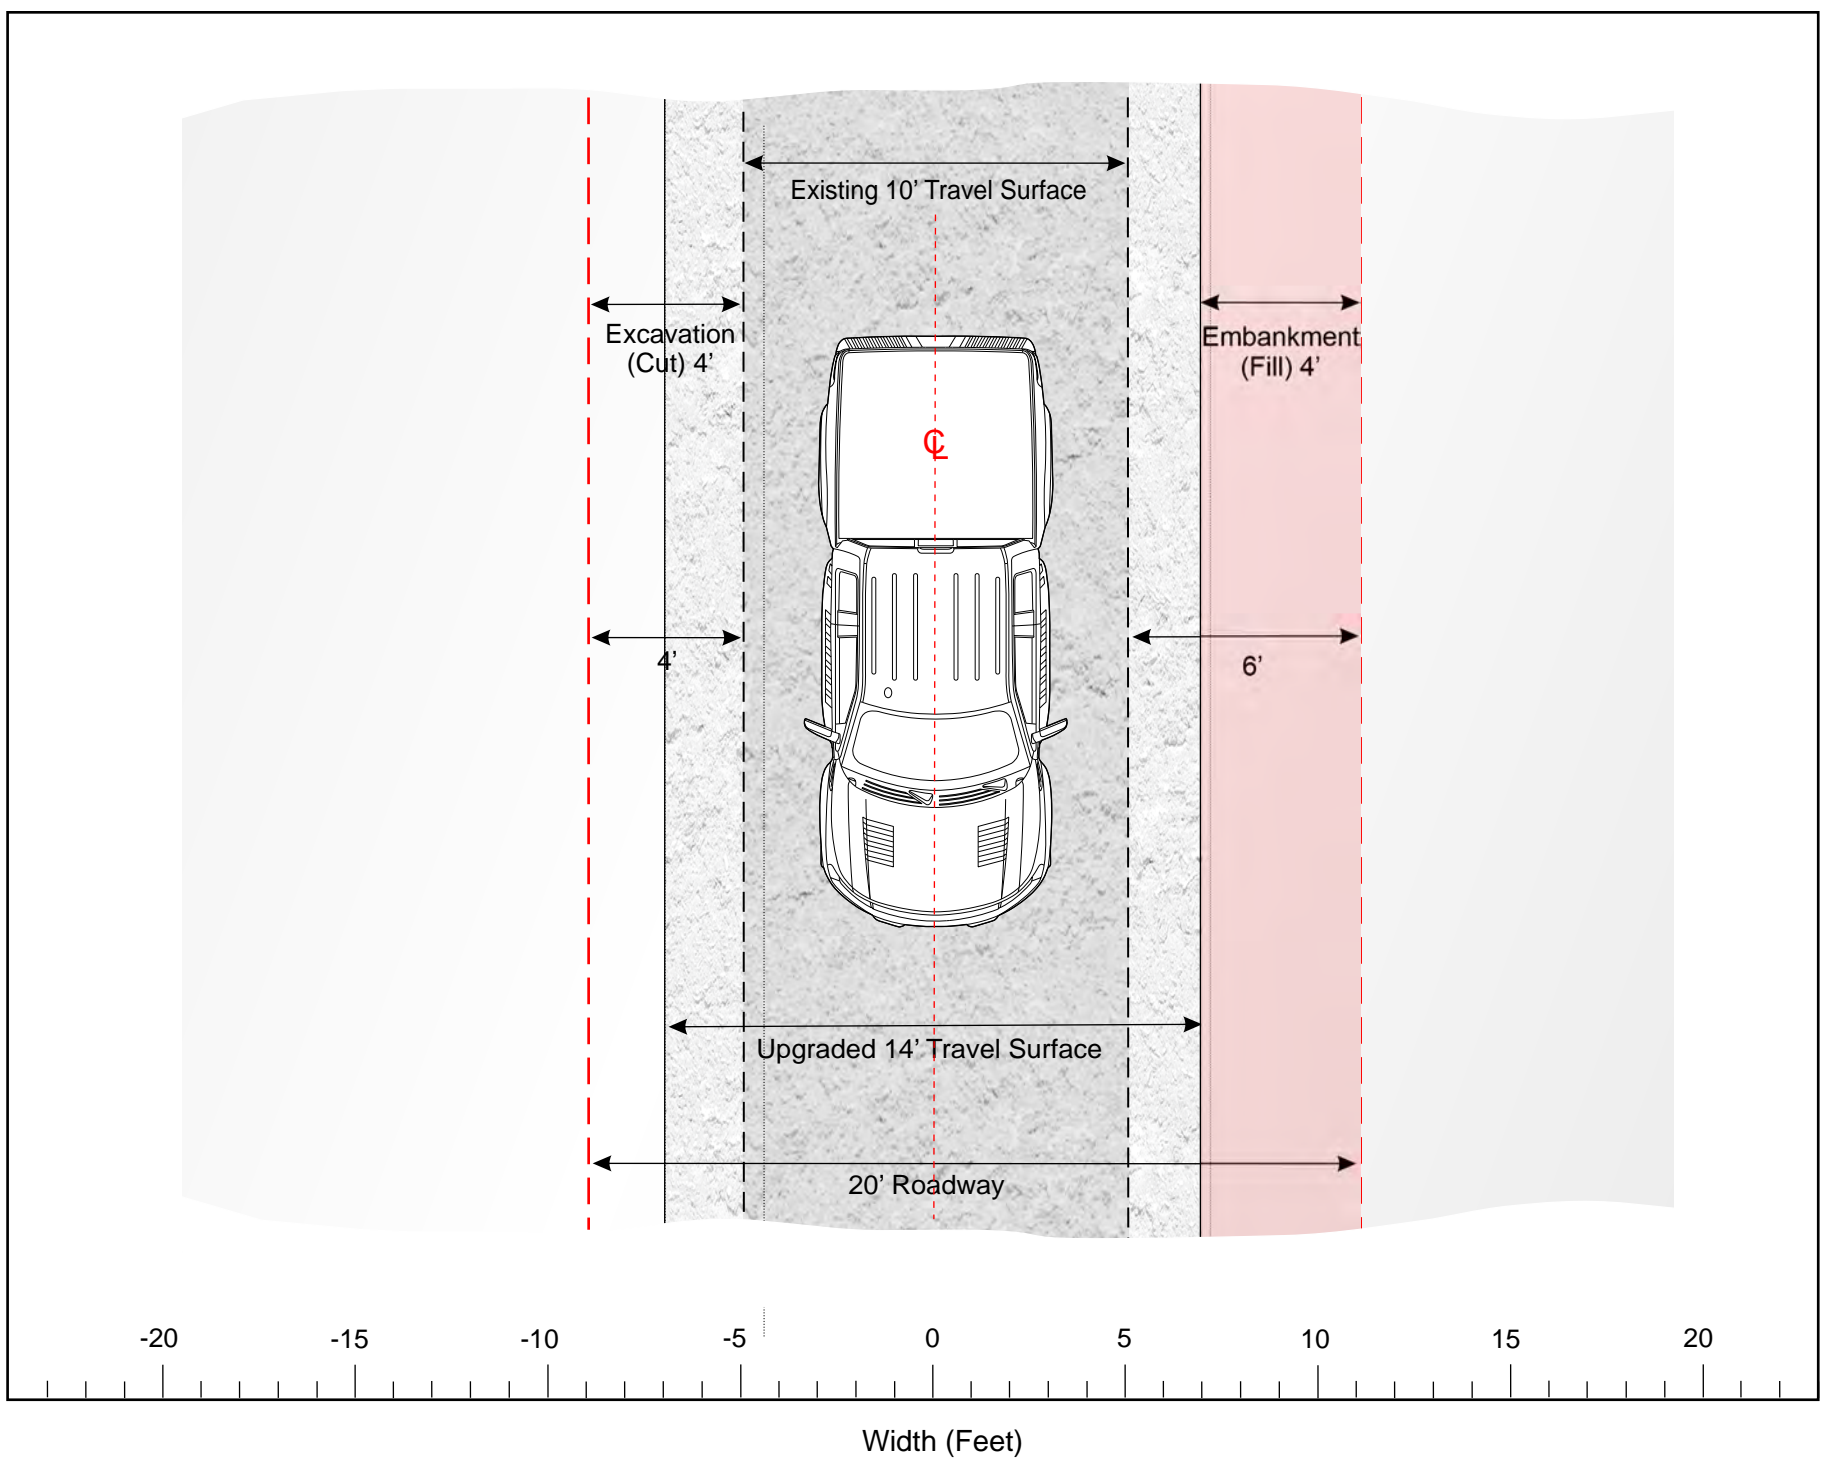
Plan View of Typical Upgraded Medium-Width Road
